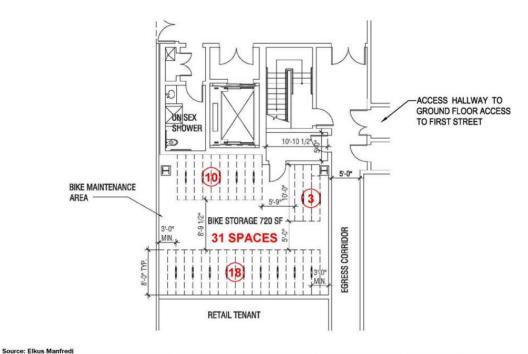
d.4 20 CambridgeSide Bicycle Parking Plan Vanasse & Associates inc
